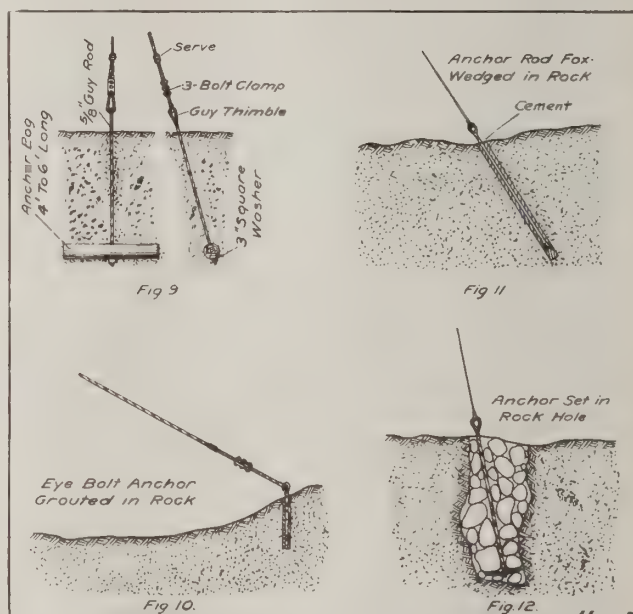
THE "DEAD-MAN" TYPE OF ANCHOR. FIG. 10. EYE-BOLT ANCHOR GROUTED IN ROCK. FIG. 11. AN ANCHOR ROD FOX-WEDGED IN ROCK. FIG. 12. ANCHOR SET IN ROCK HOLE WITH CEMENT.
